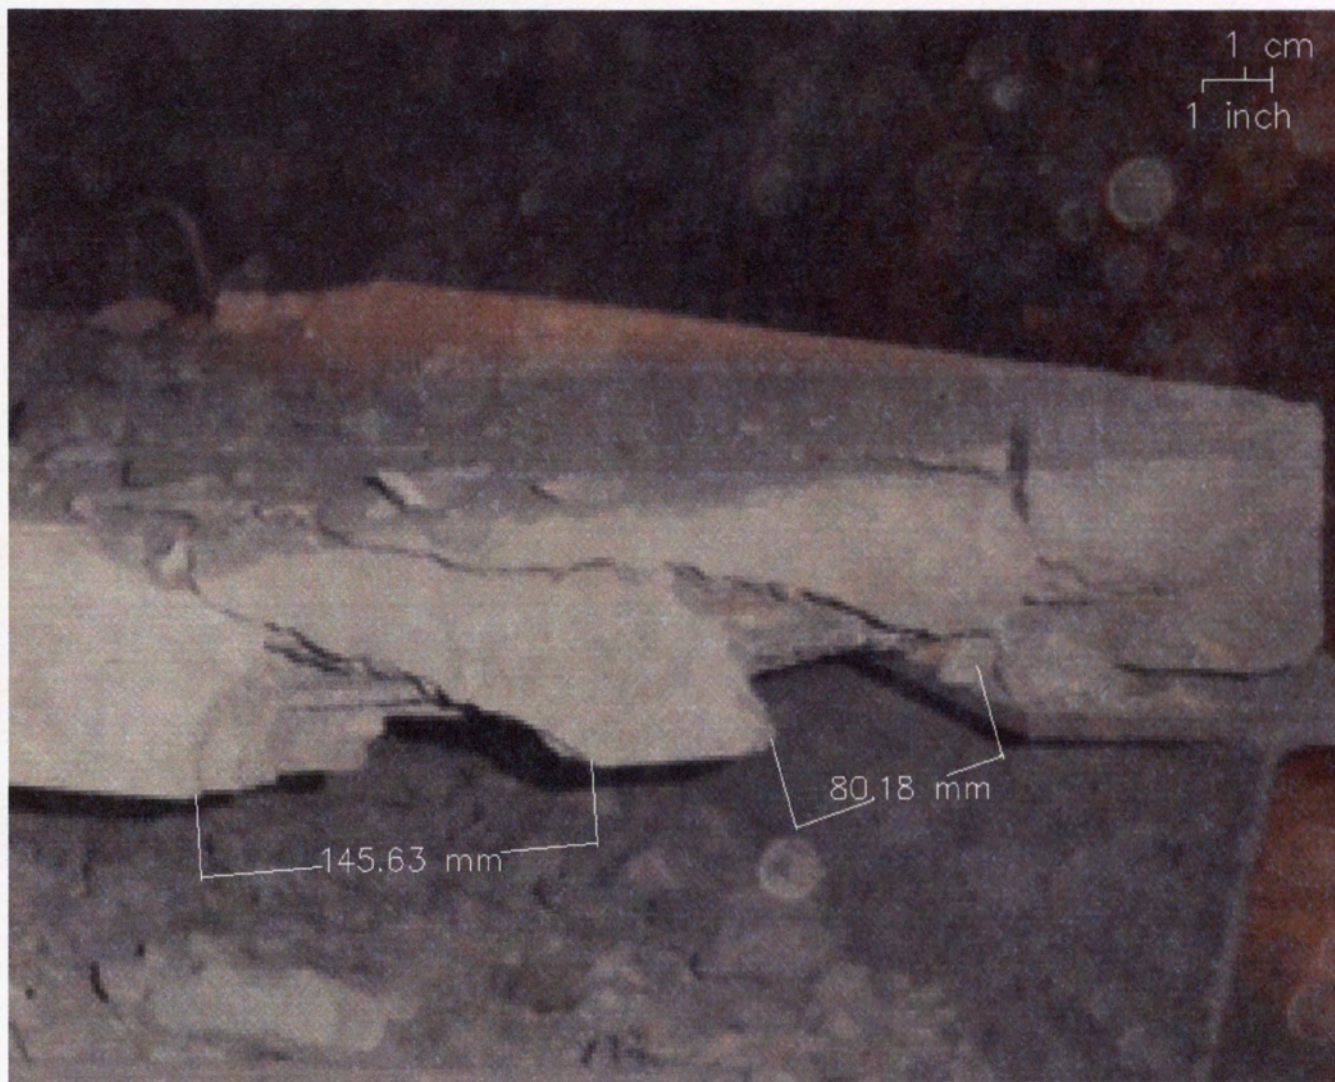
Shear Cracks in the Front Face of 1-RC
